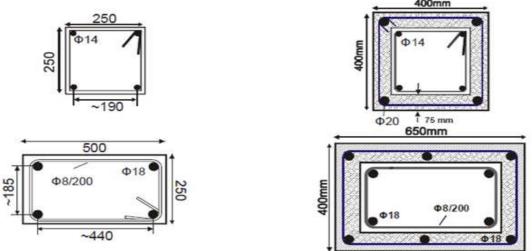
Cross - section of original test columns and of RC-jacketed ones
